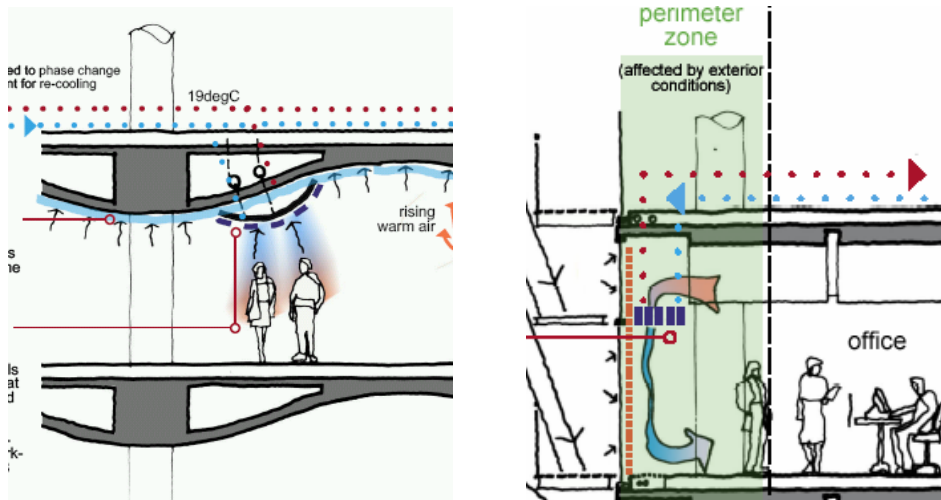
Chilled beams and ceiling panels CH2 (Stephen Webb, DesignInc Melbourne)
